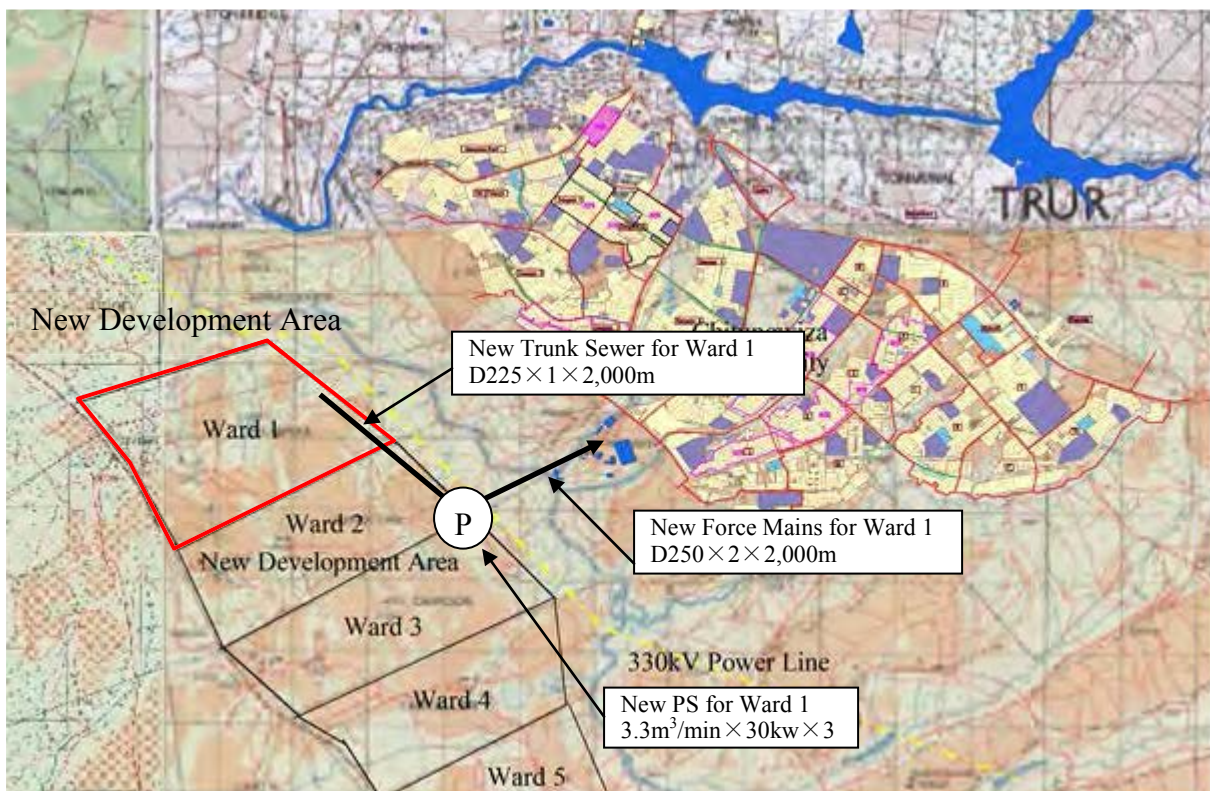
Ward 1 Development and Plan of Sewerage
